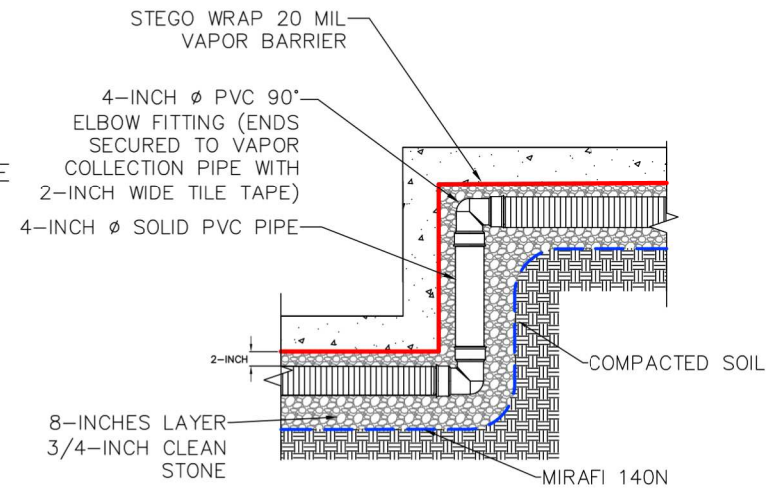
TYPICAL CAP TERMINATION CONNECTION FOR VAPOR COLLECTION PIPE
